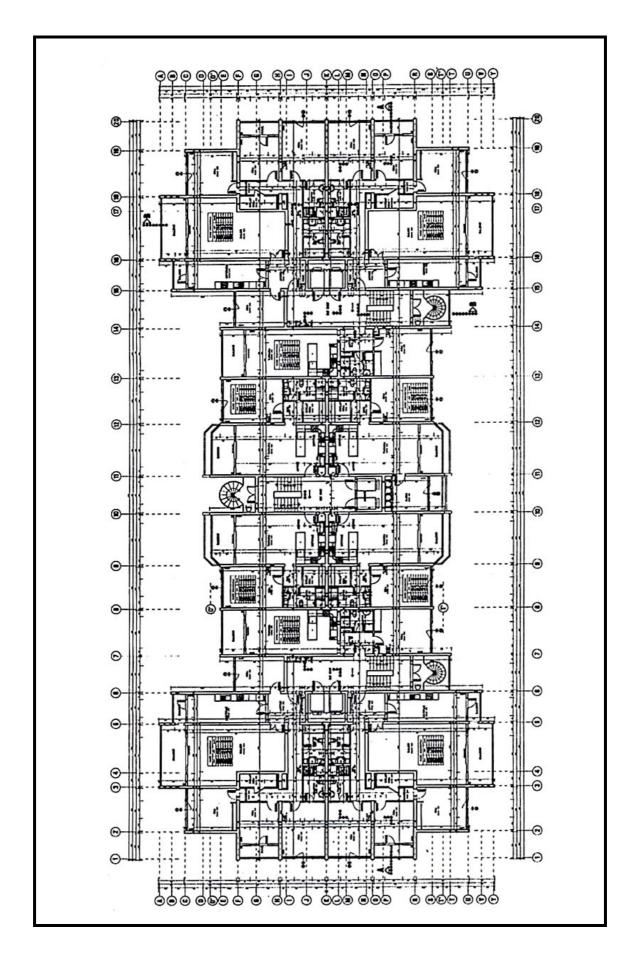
Mavişehir II; Kuğu 5th – 11th Floor Plan
